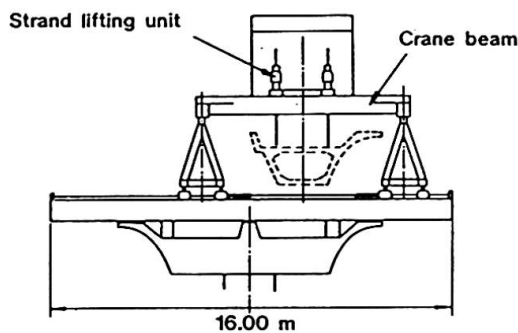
(a) SECTION THROUGH TYPICAL LAUNCHING GANTRY
